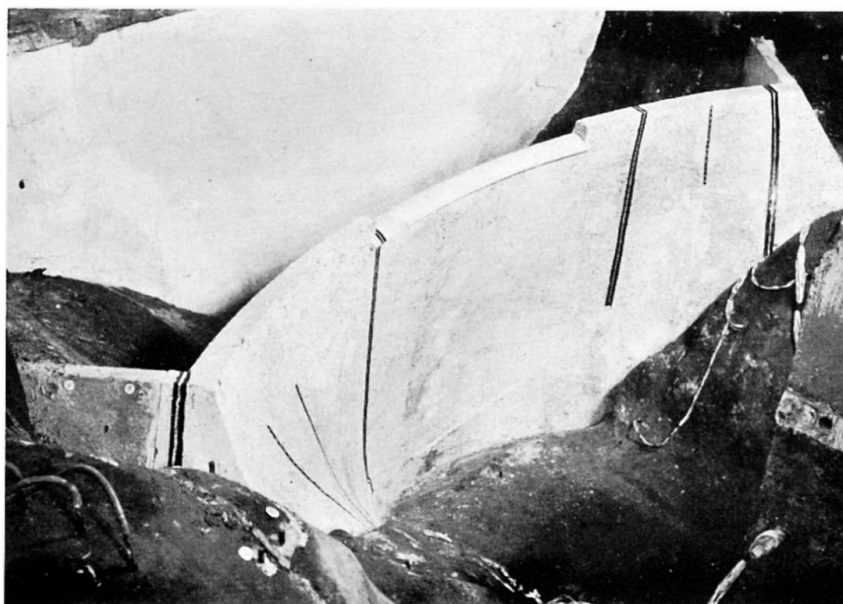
Kurobe IV Dam. Structural model at failure, showing the opening of joints.
